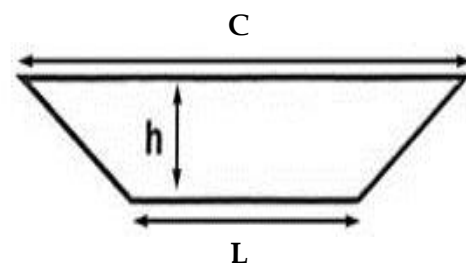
Trapezoidal cross section of a landfill in other dimension
